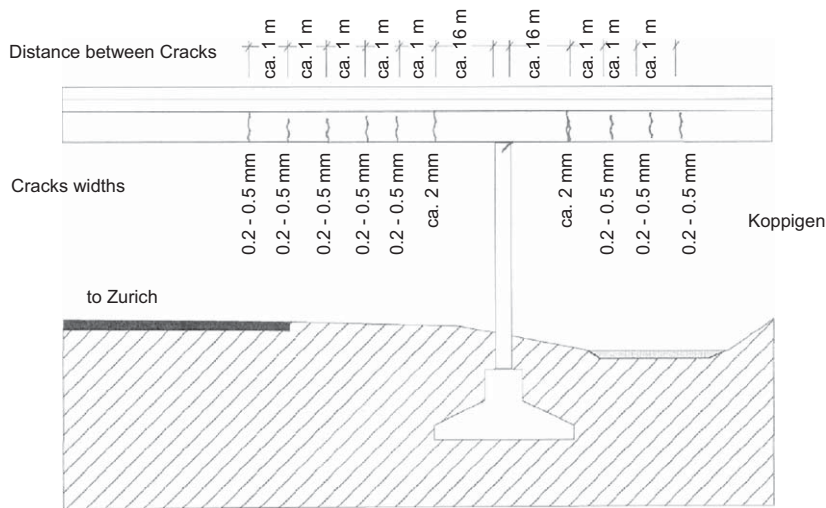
Z24 bridge: observed cracks after a pier settlement of 90 mm (scenario 6).
